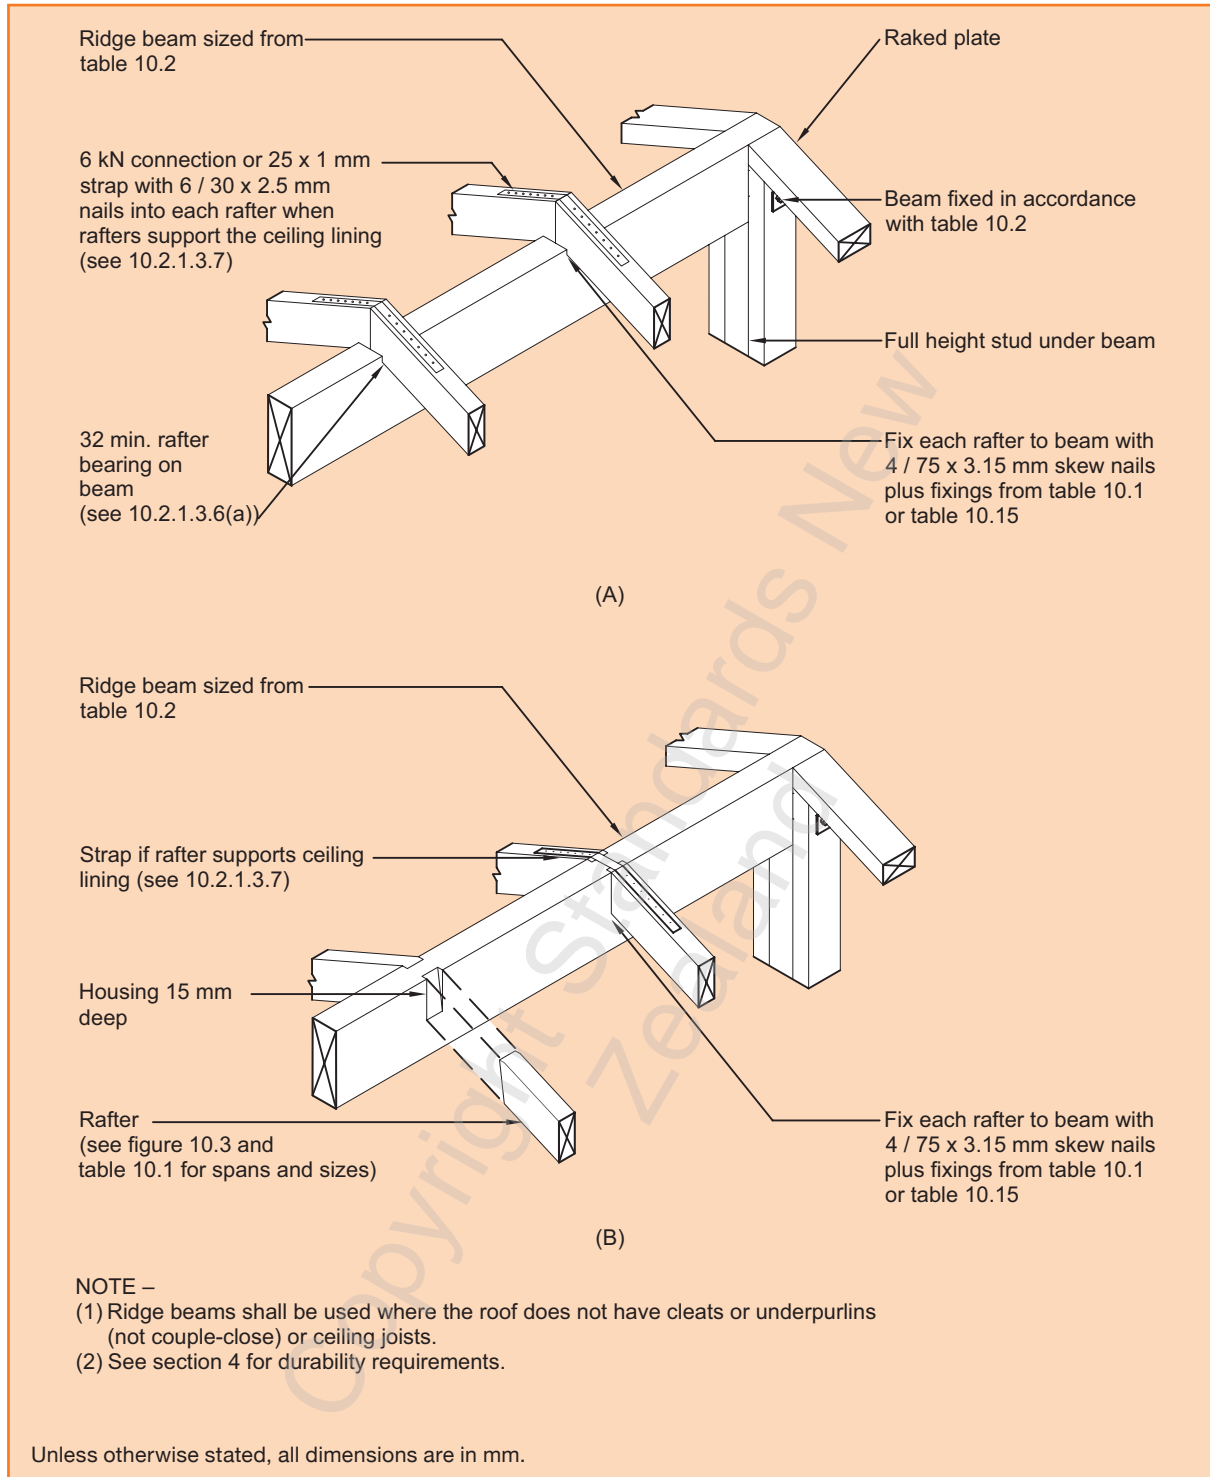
Rafter to ridge beam connections (see 10.2.1.3.6)
